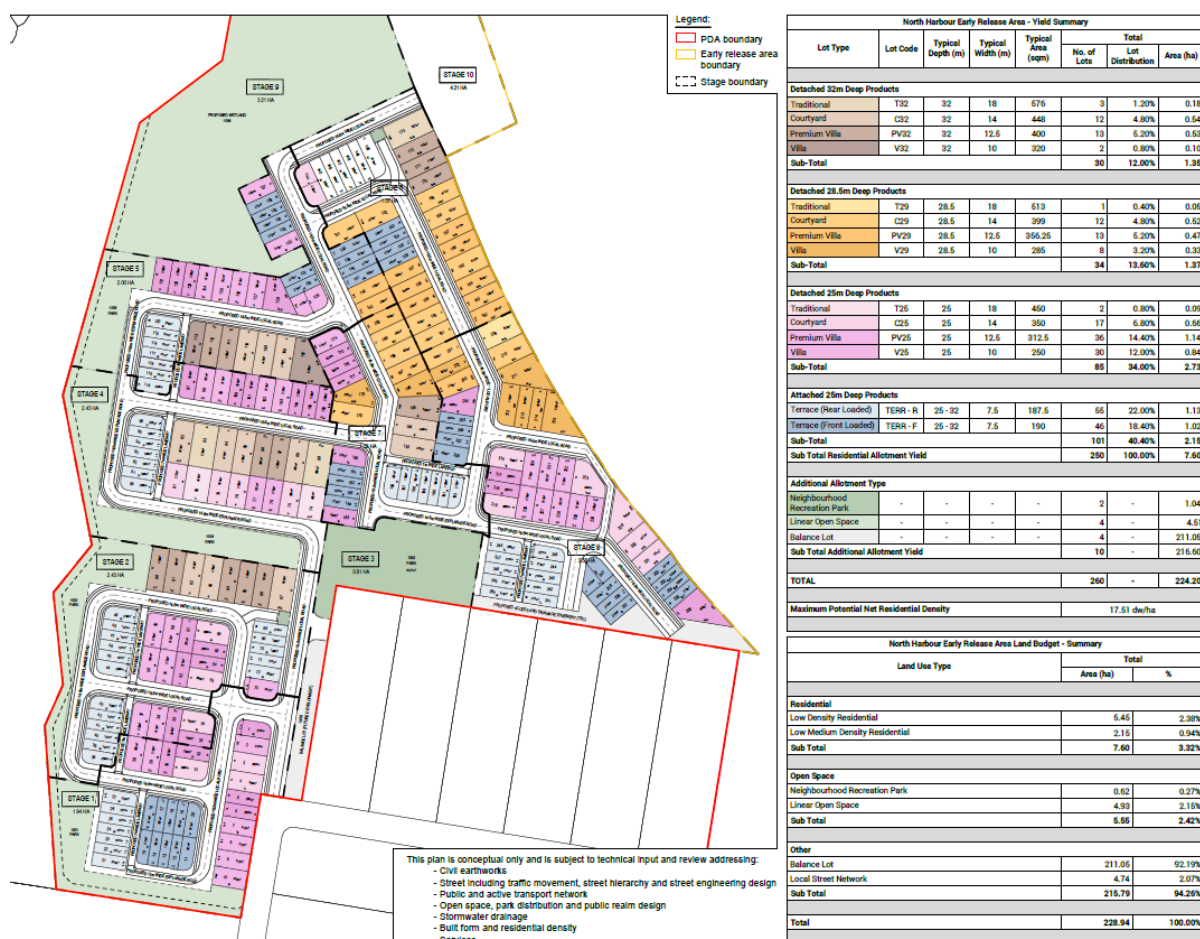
Extract of proposed Reconfiguration of a Lot (Source: Place Design Group, 2025)
